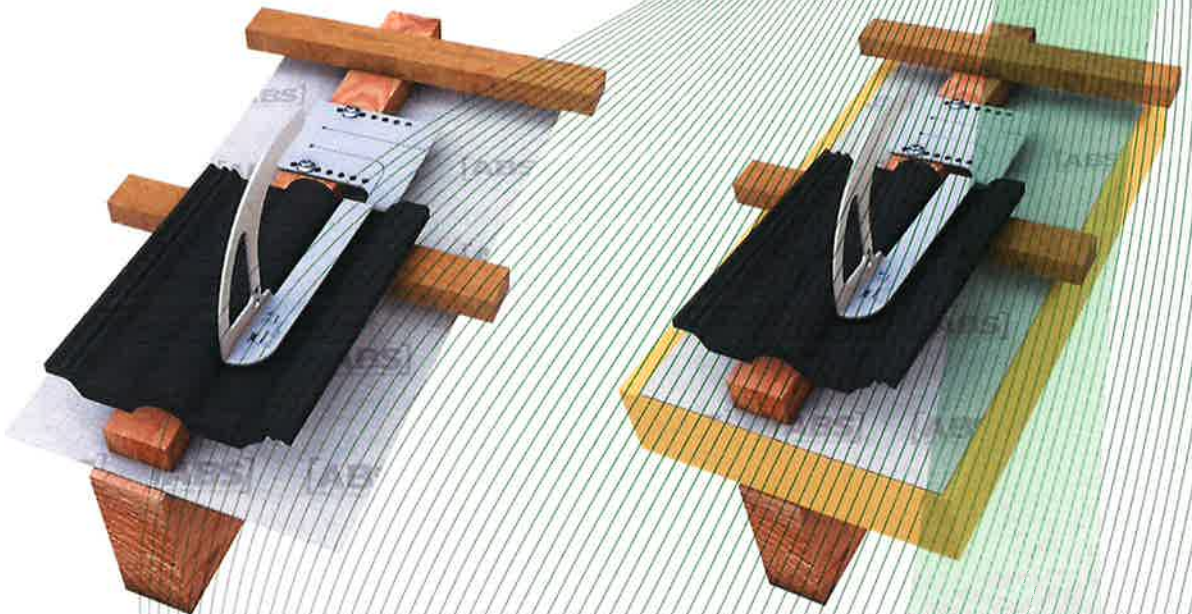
Safety roof hook, type ABS-Lock® DH-05 (assembly example)
